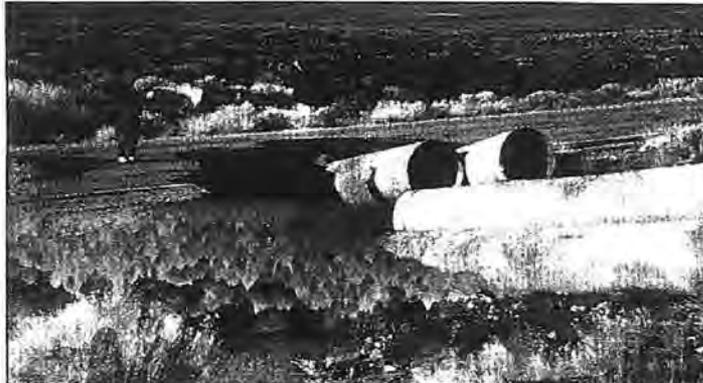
Culvert damage from runoff of March 11, 1995, along Stockade Wash at Airport Road, Nevada Test Site.
